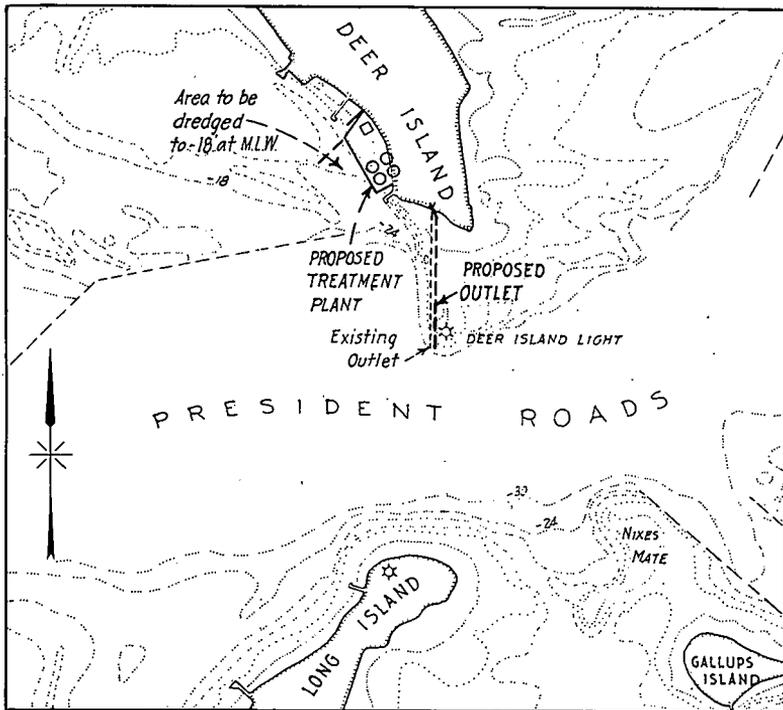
LOCATION PLAN OF SEWAGE TREATMENT PLANT AT DEER ISLAND
